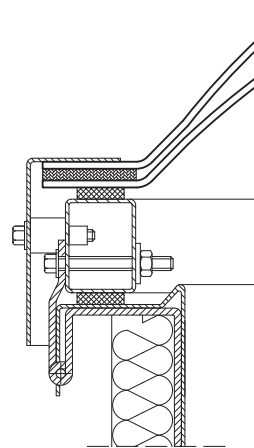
Vent section, glazing: double-layer acrylic dome
